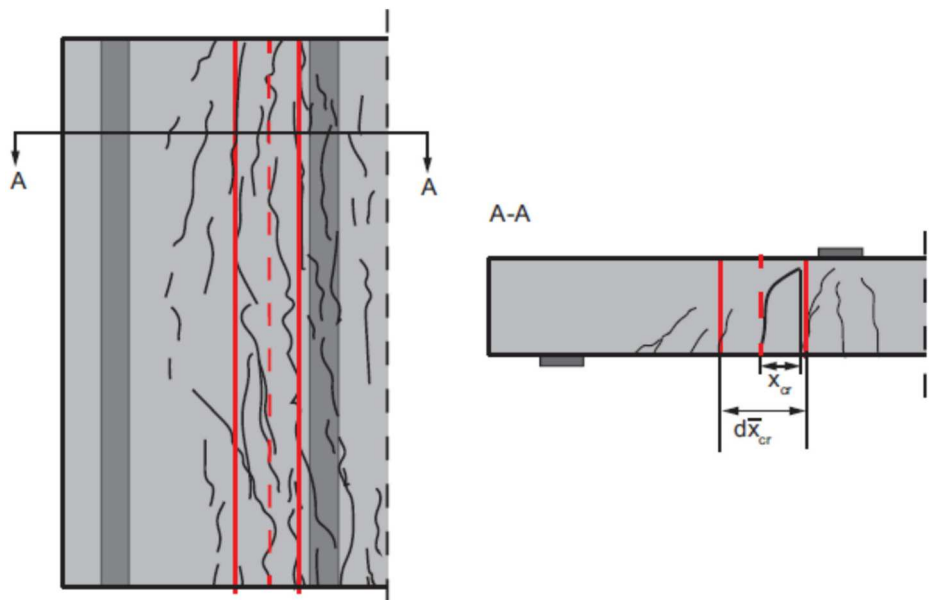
Sketch of crack pattern of a reinforced concrete slab subjected to a line load (showing bottom face and section A-A), evidencing the waviness of the transverse crack profile. Modified from Ref. [48]
